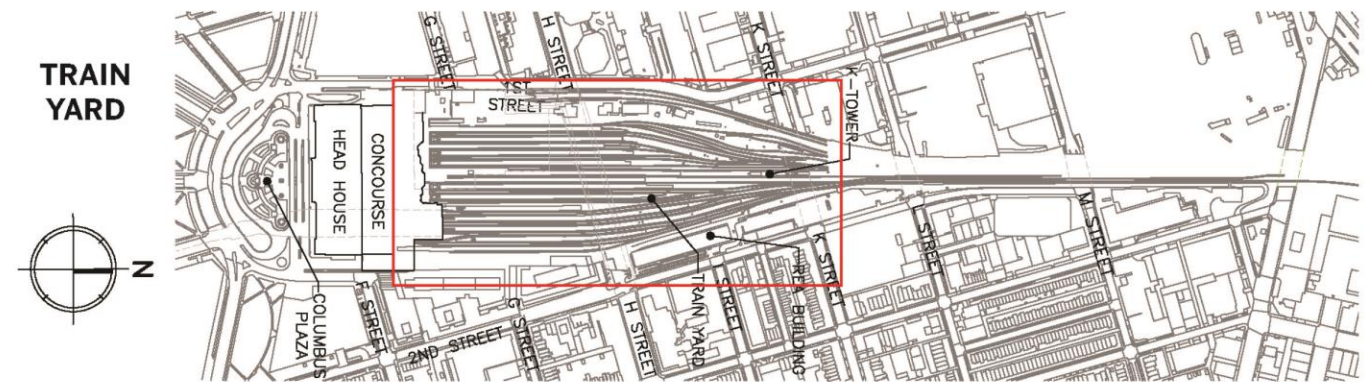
Graphic documentation of the retaining walls and underpasses at the south end of the Terminal Rail Yard.
